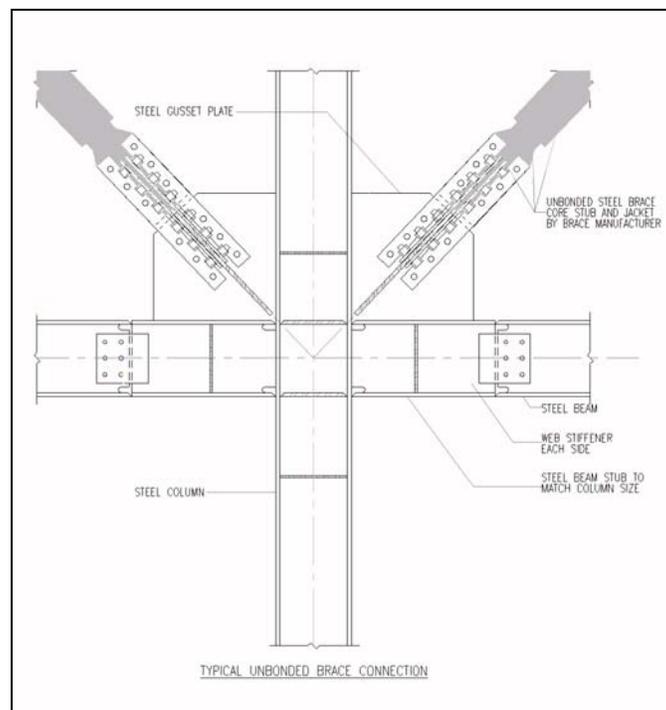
Typical Detail for Unbonded Braced Frame Connection.
